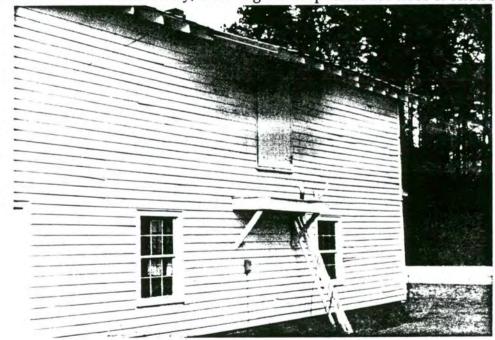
Griffen's Hatchery, showing added packhouse door & shed roof
